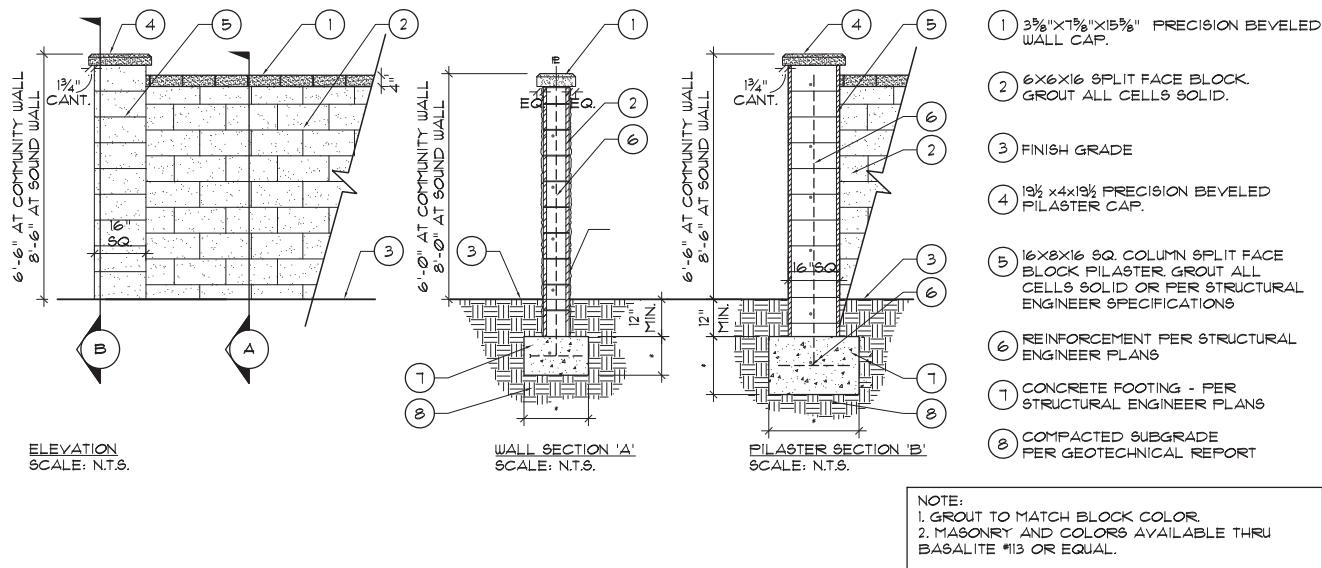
6'-0" Builder Block Wall or 8'-0" Sound Wall
